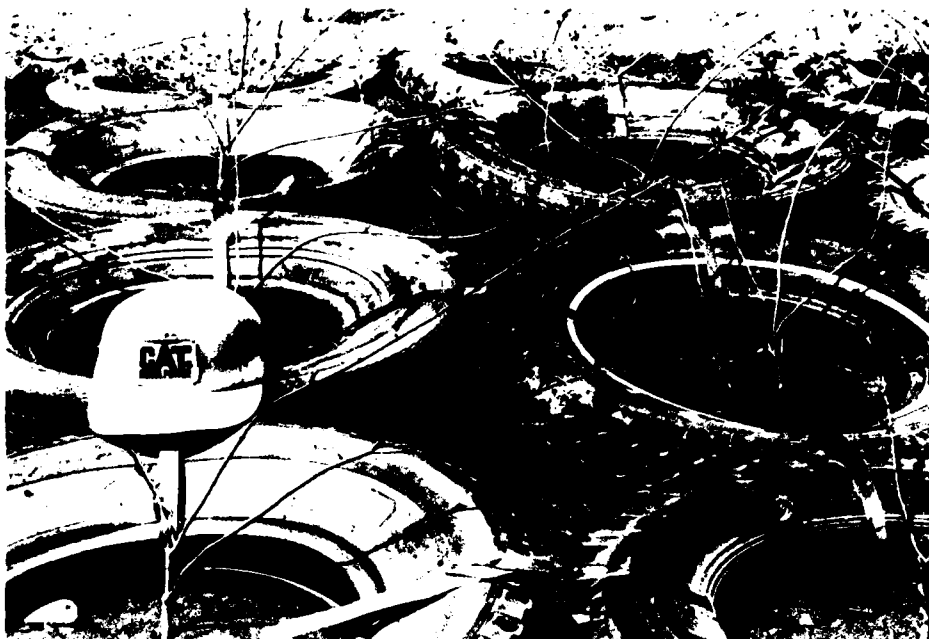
Site A, close-up of rubber tire mattress immediately after construction. 21 Mar 81
